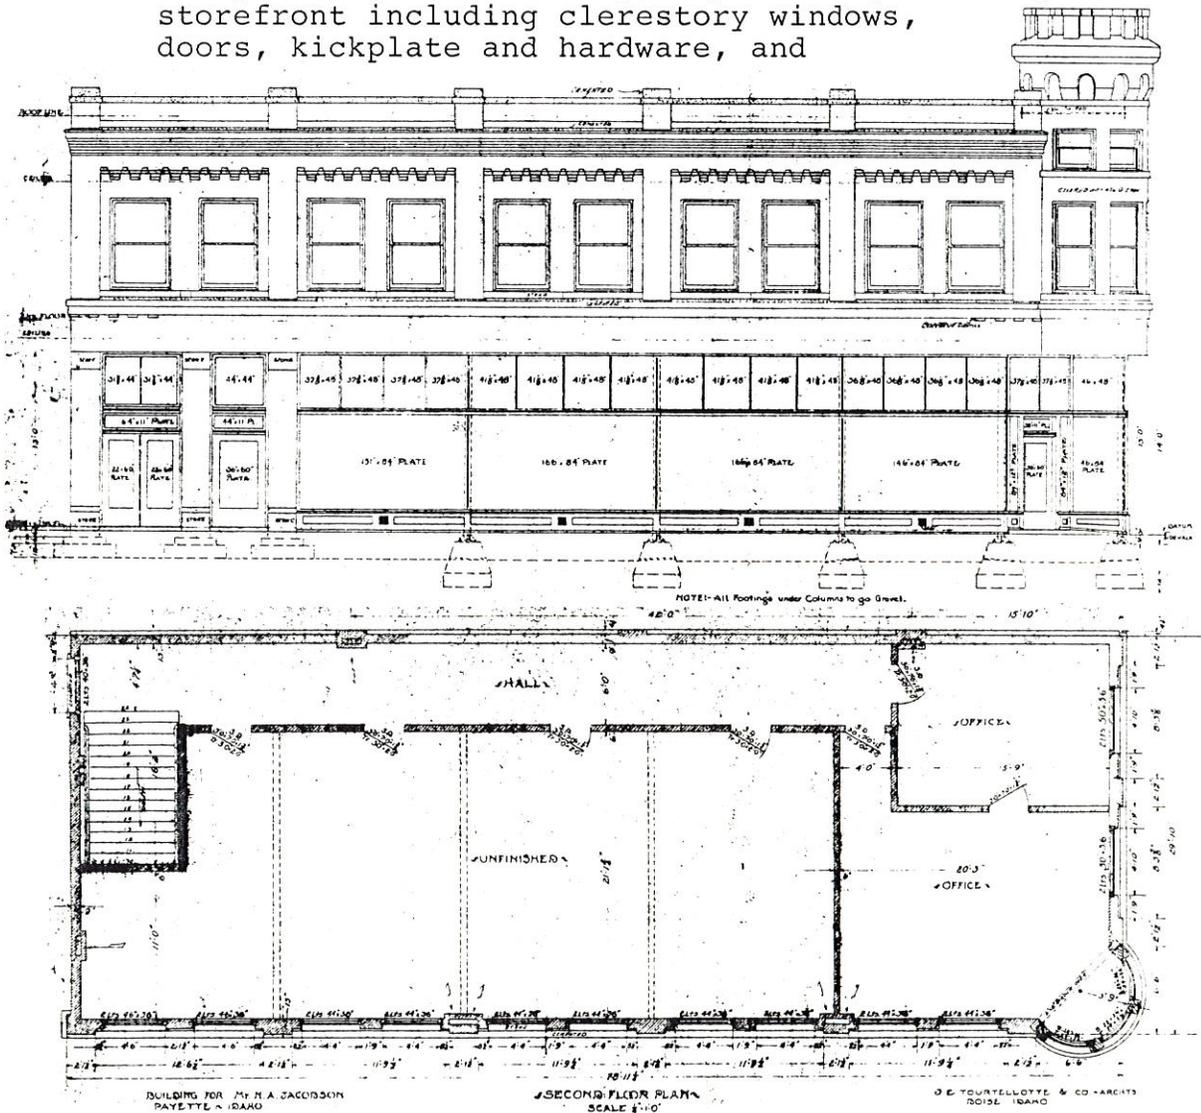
Architectural drawings of north elevation and second floor plan of M.A. Jacobson building.
